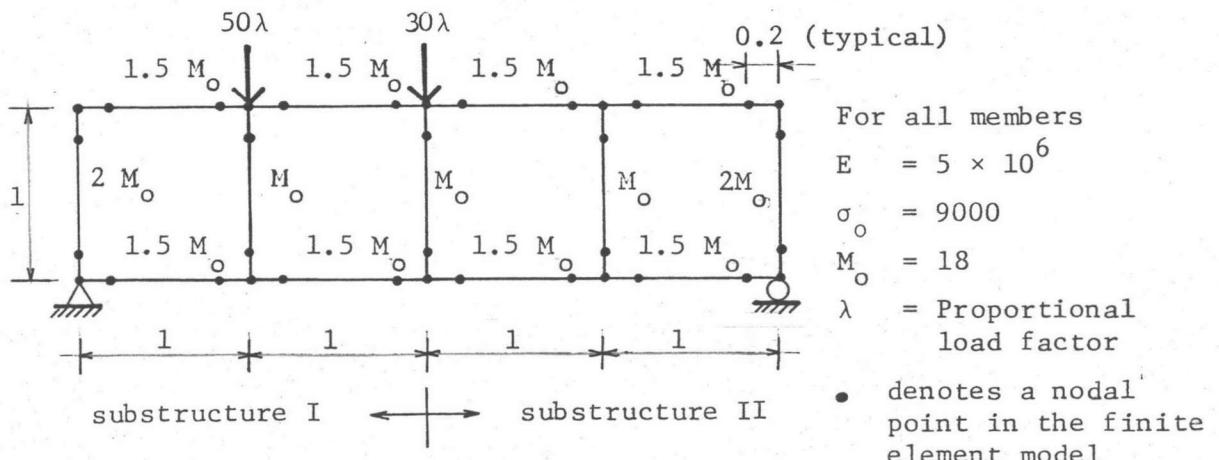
(a) Vierendeel Girder - Geometry and Loading
